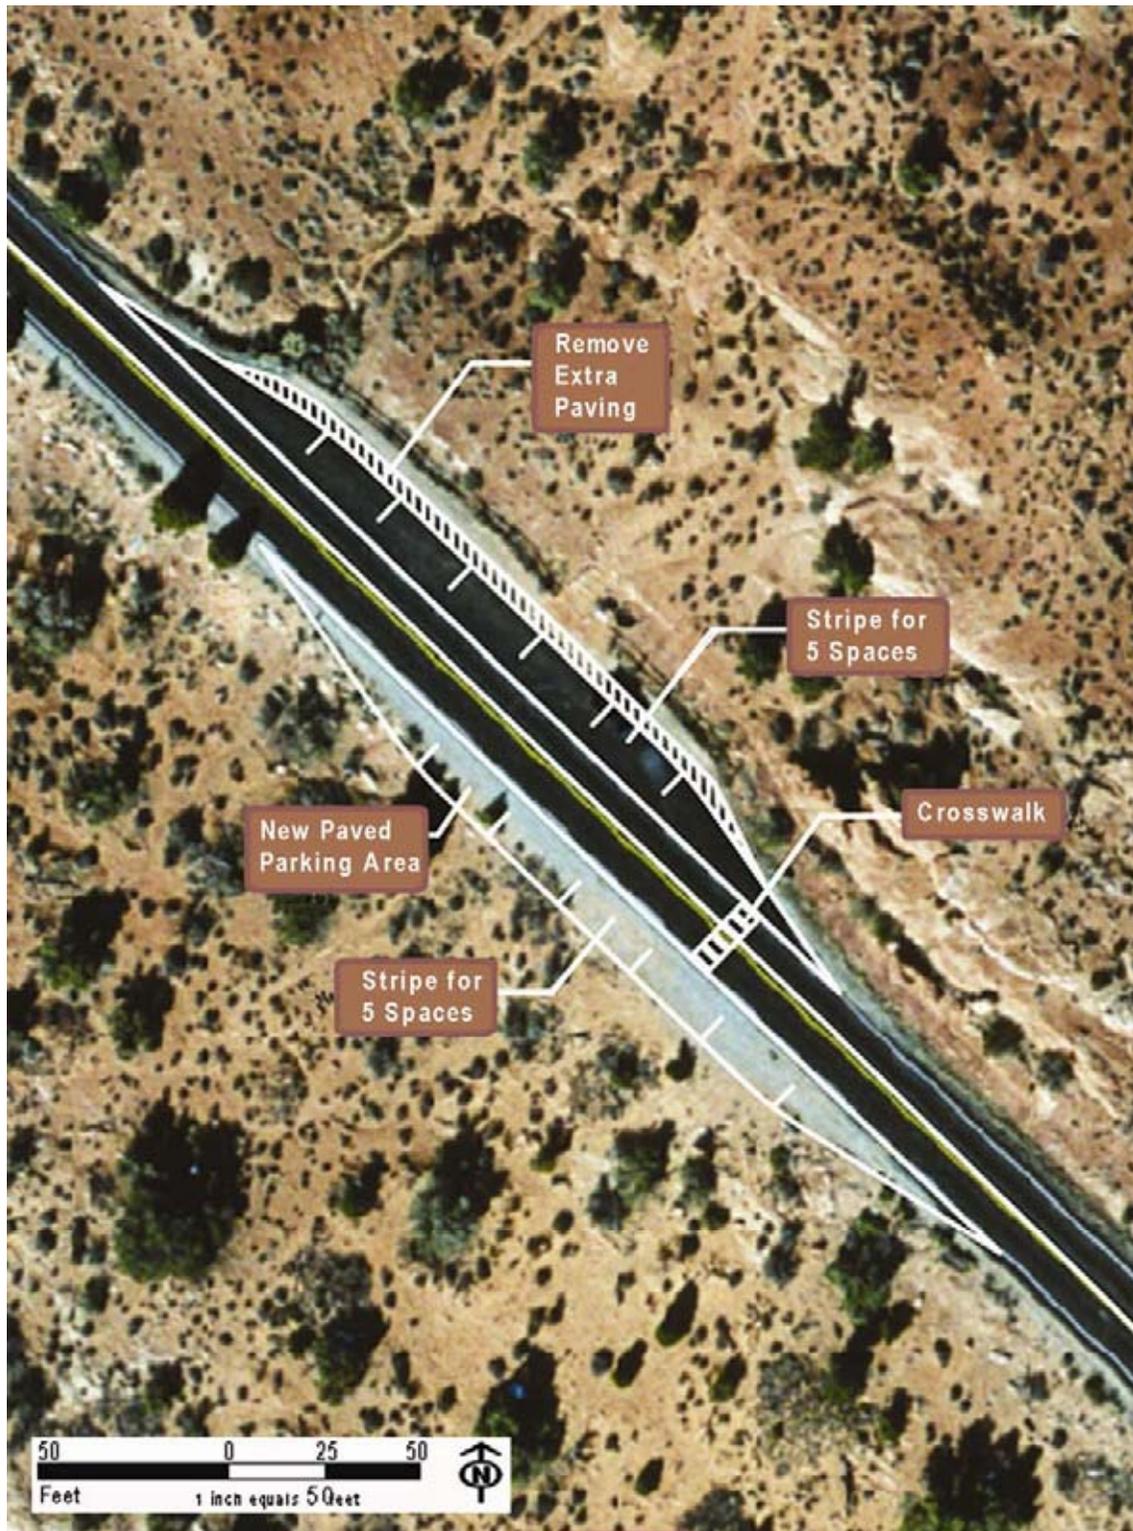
Proposed Improvements to the Devils Garden Parking Area
